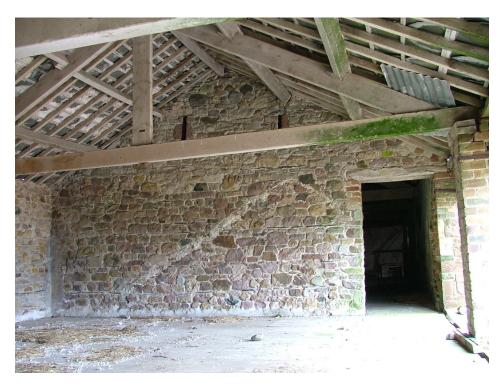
Scarring of a former roofline and ventilation slits, eastern wall of Barn D, as seen from the first floor of Barn C
